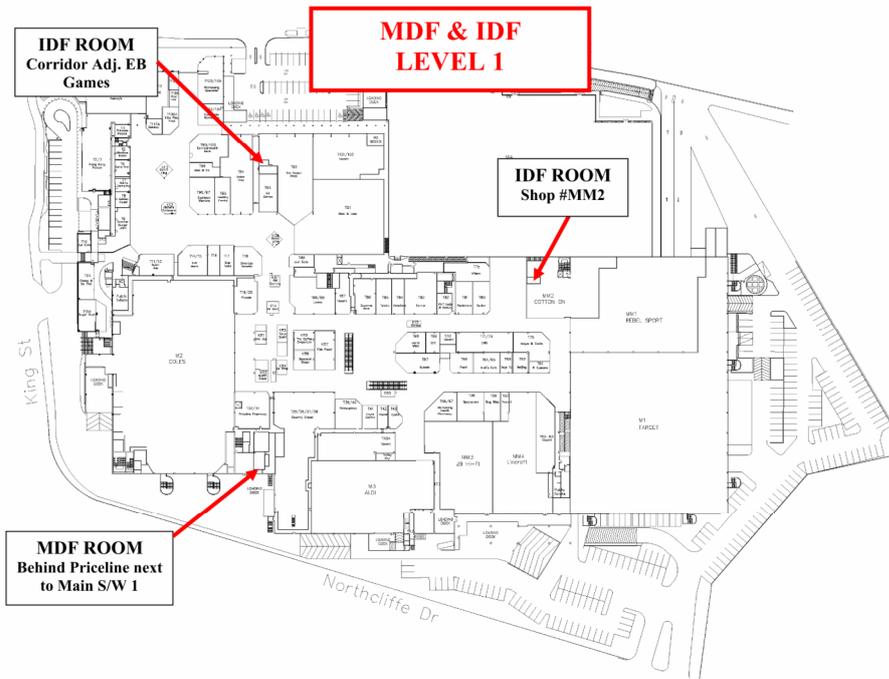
Critical Isolation Plan Level 1 Showing IDF Rooms
